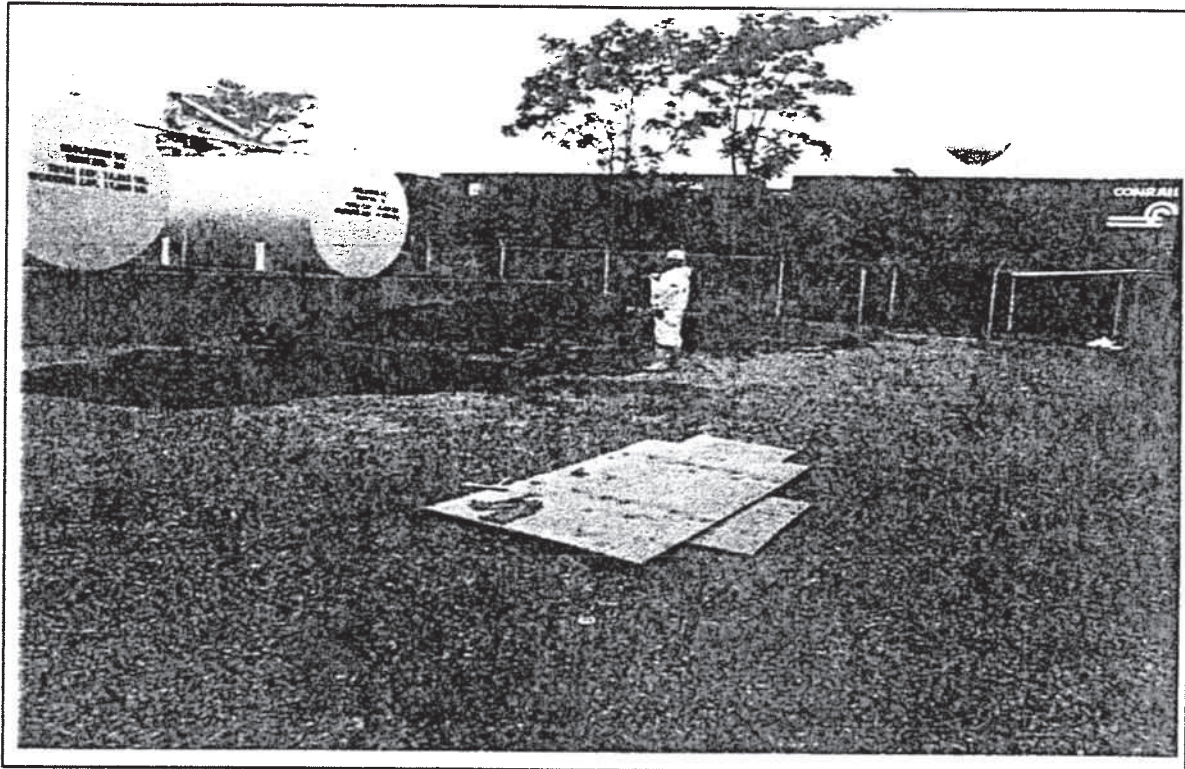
Looking south at commencement of main excavation. South Dewatering pit in forefront.
